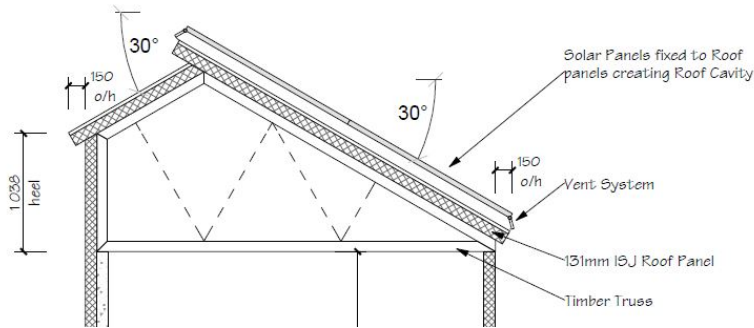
Section View of the Initial Roof Design at 30°
